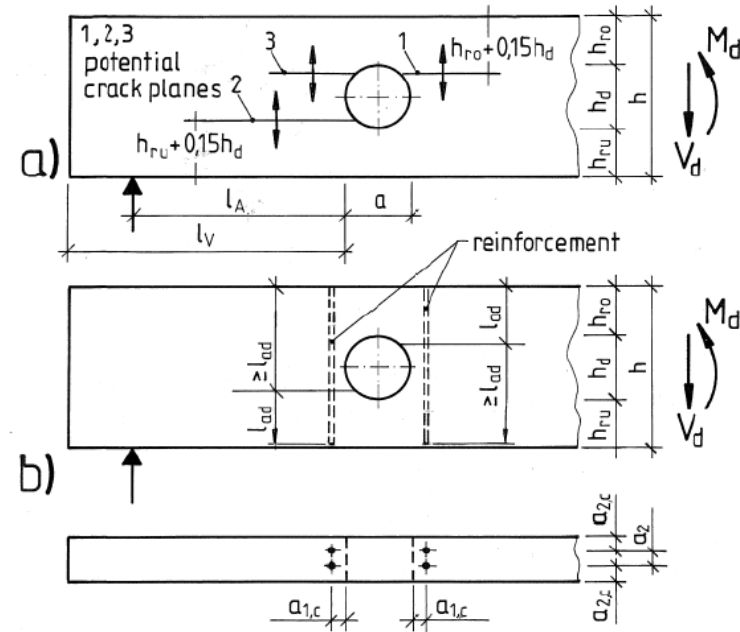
Geometry notations and endangered/potential crack planes of unreinforced and reinforced glulam beams acc. to DIN 1052:2008
